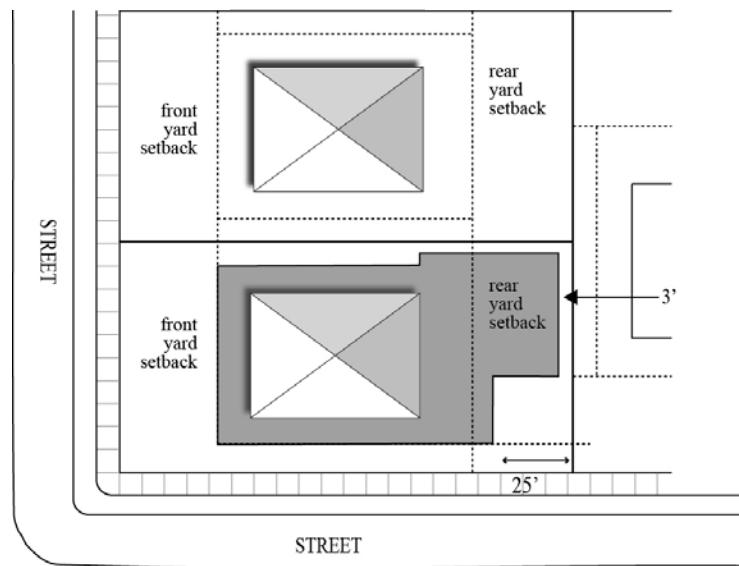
Accessory Building Placement for Reverse Corner Lots.
